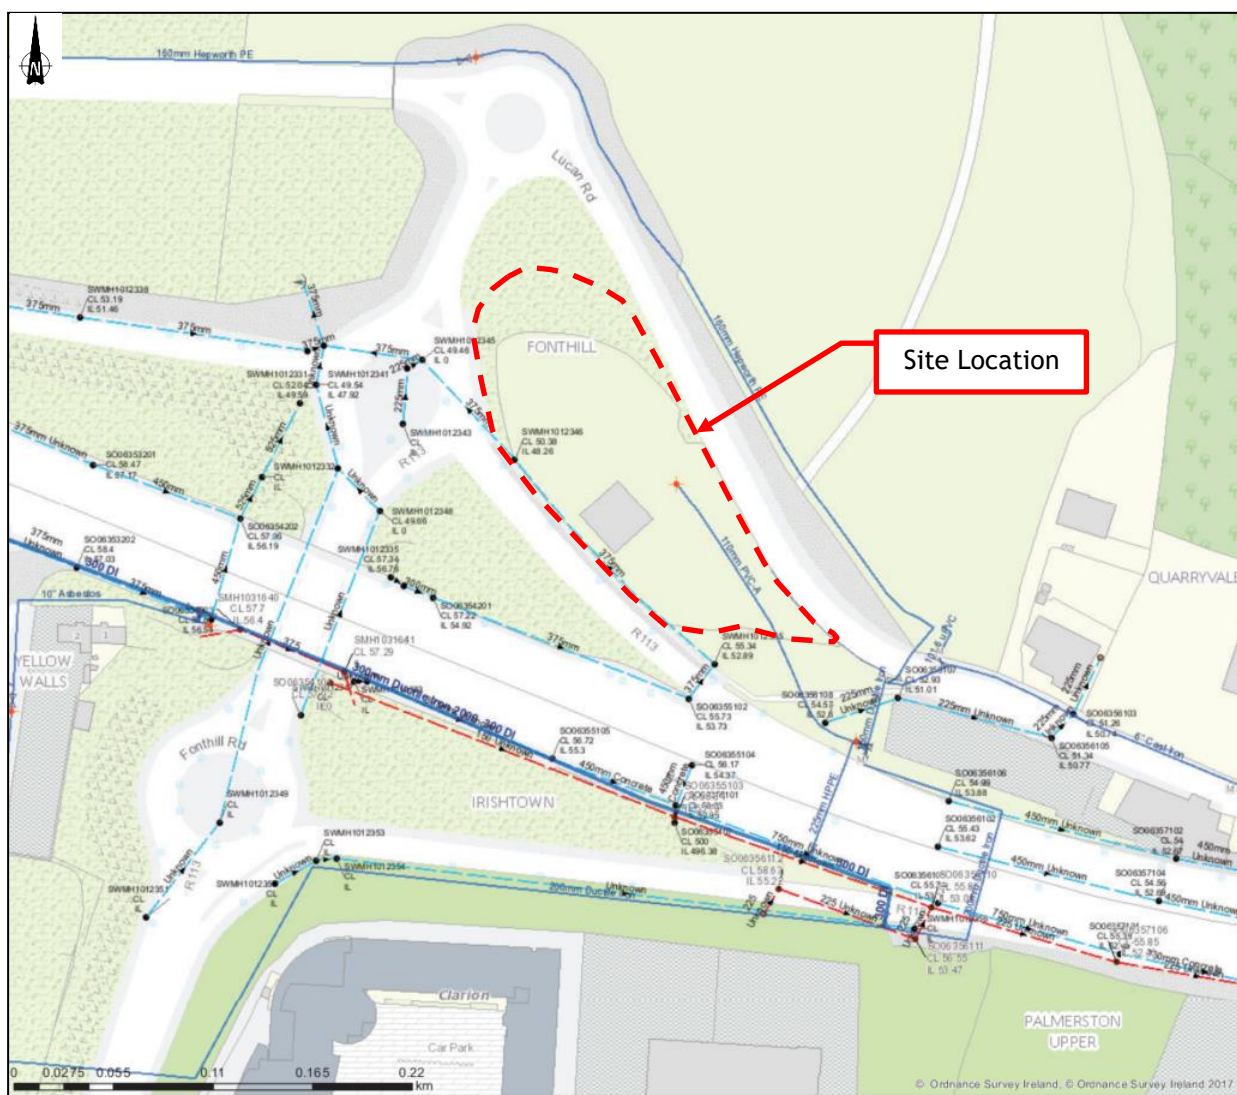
Existing Foul Drainage Surrounding the Site (Extract from Irish Water records)
